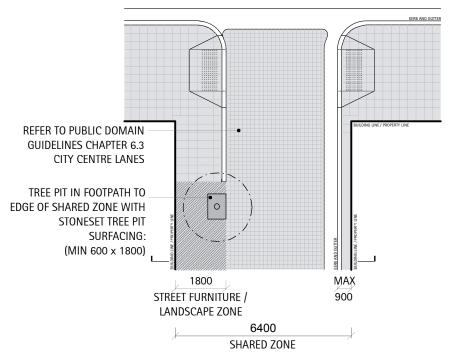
Street Tree Typical Pit Location: 6400mm Wide Lane
